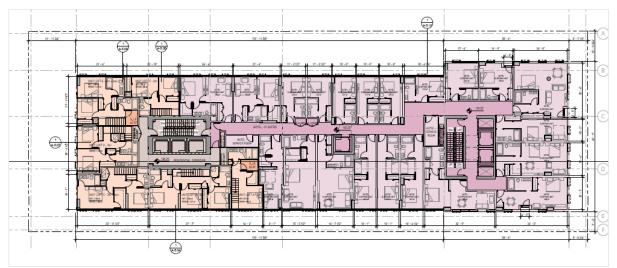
Proposed Hotel and Rental Floor Plan Floor 5
